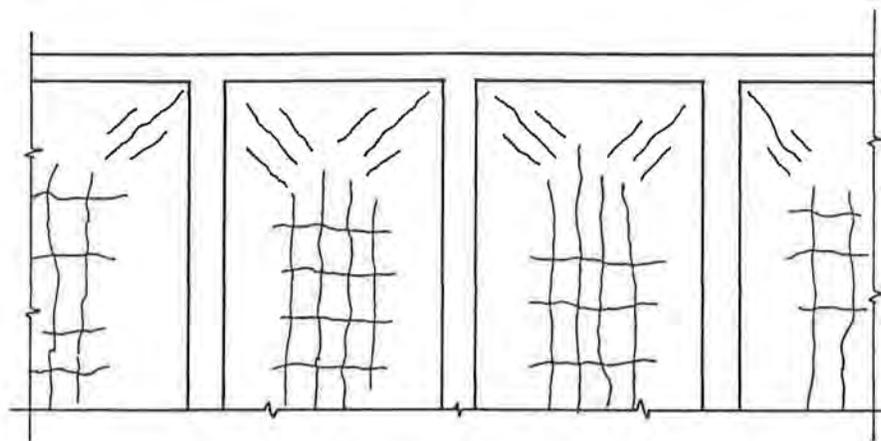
Underside of Slab-Girder Bridge Deck (Ref. Unknown)
